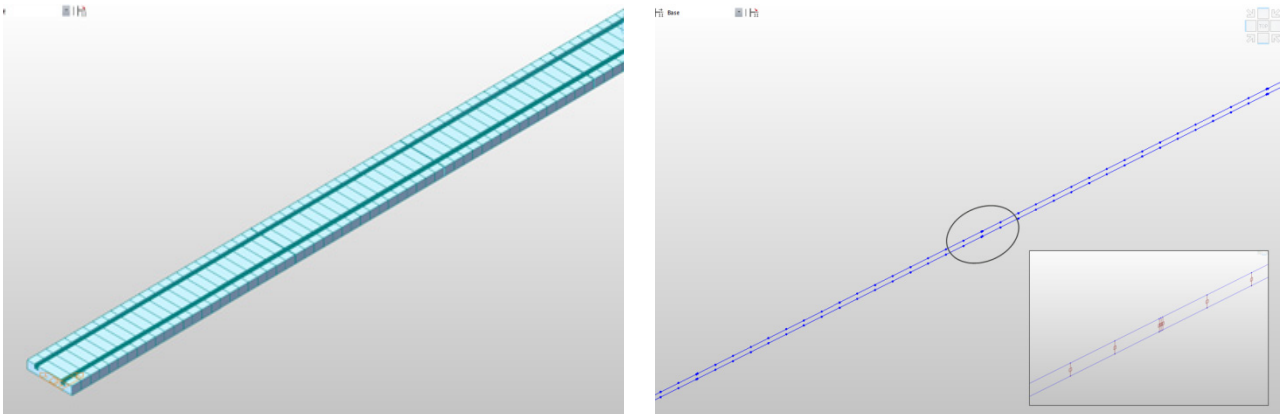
Track slab longitudinal model. Solid model shown left and line model shown right. Springs connecting slab and rail are shown on the right insert
